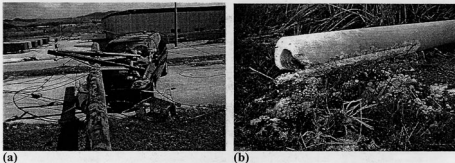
Typical strong wind damage to (a) wooden power poles and (b) hollow-spun concrete power poles.
